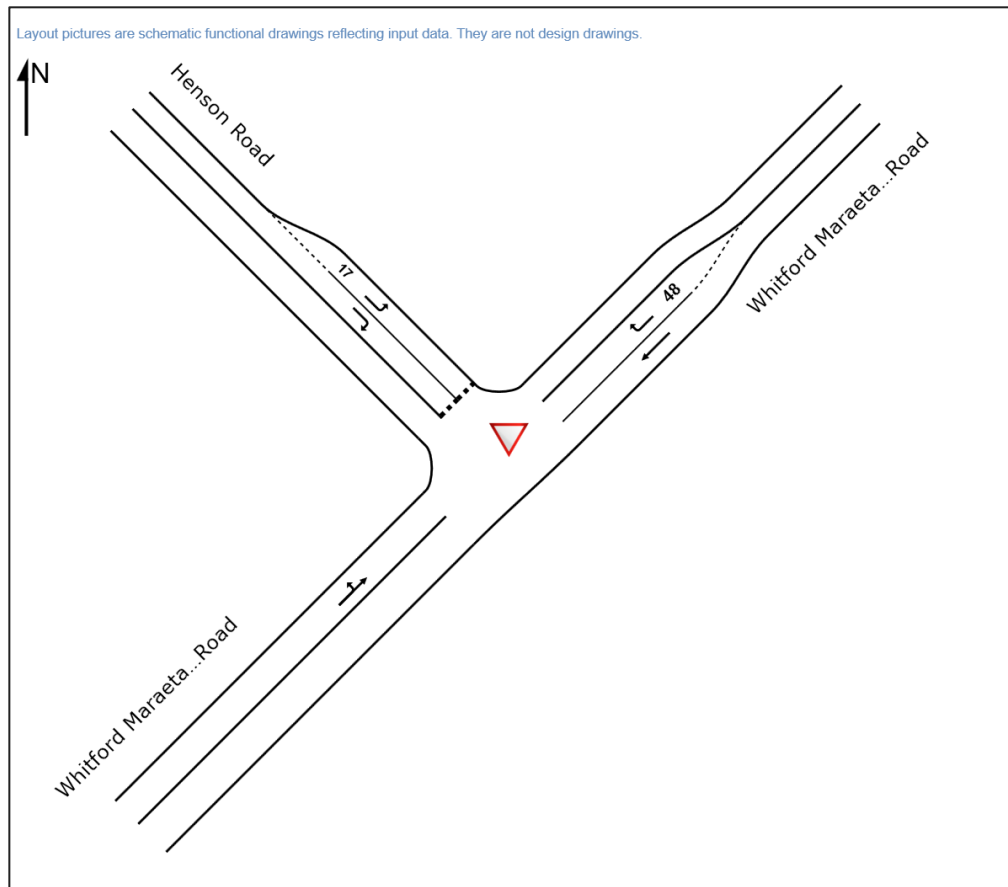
Existing Whitford-Maraetai/Henson Road Give-Way controlled intersection
